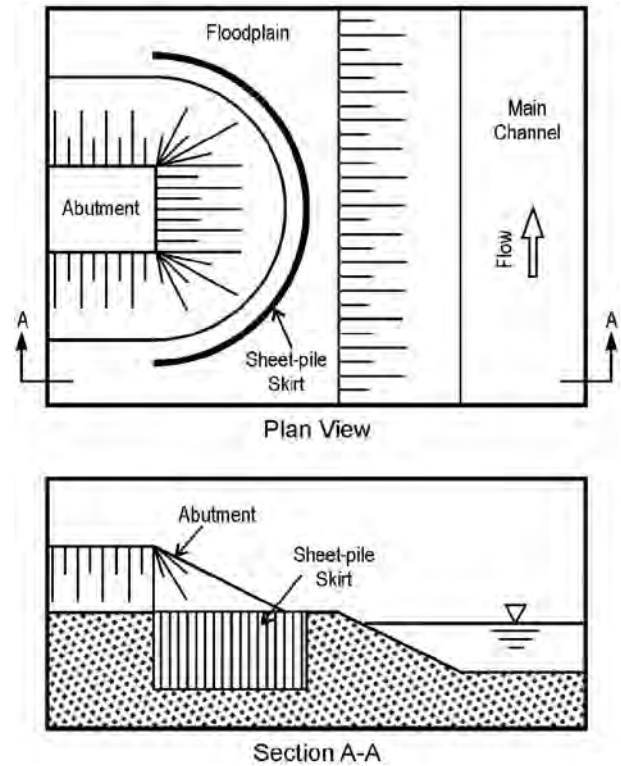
Sheet pile skirt around a spill-through abutment.
